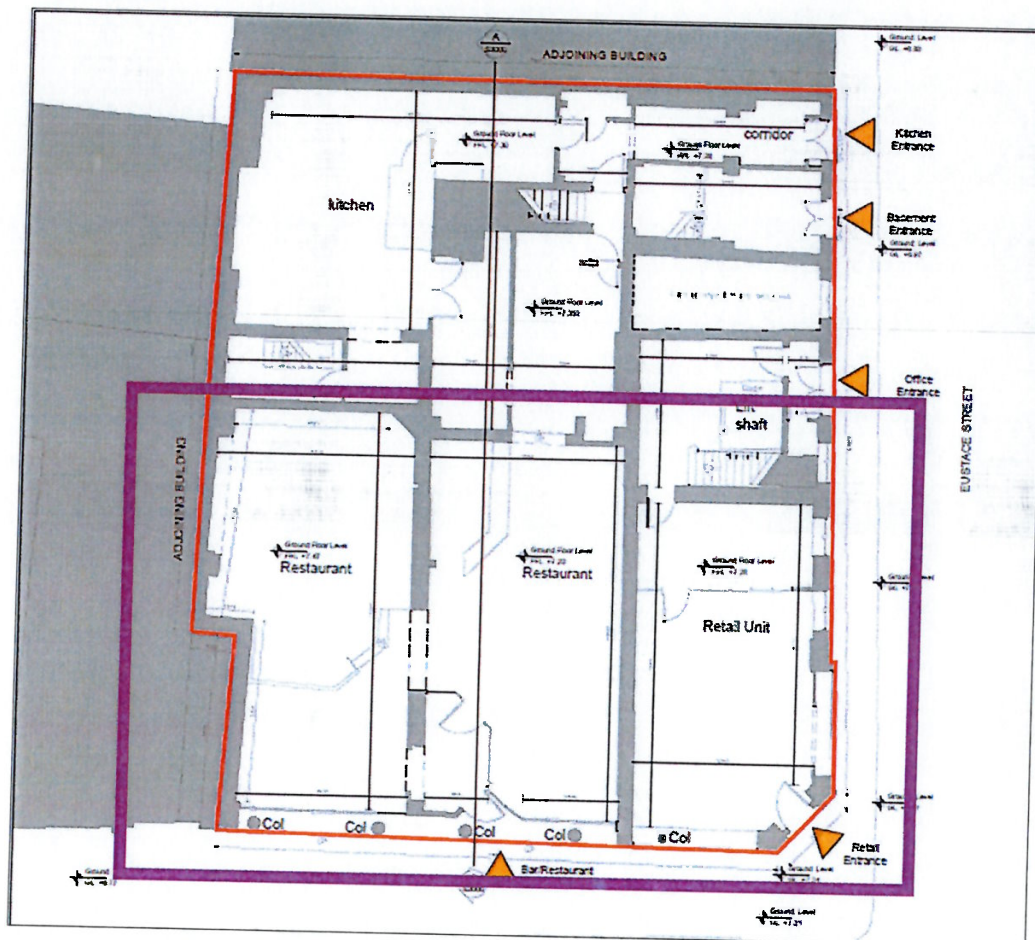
Ground Floor Plan prior to Works Taking Place
